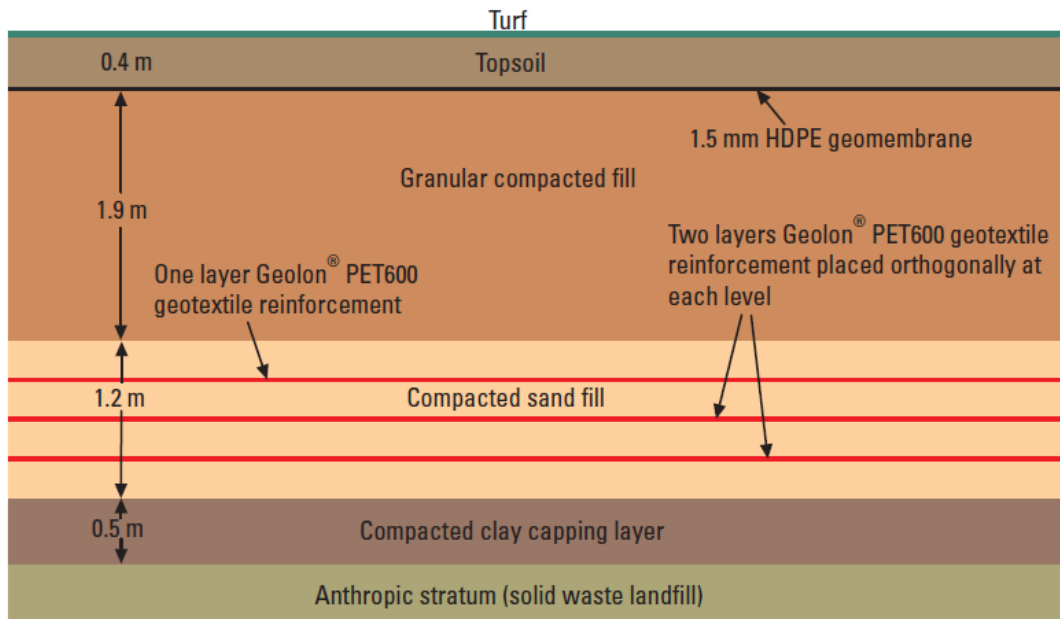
Cross section details through the reinforced foundation, Barcelona, Spain (Tencate, 2010)
